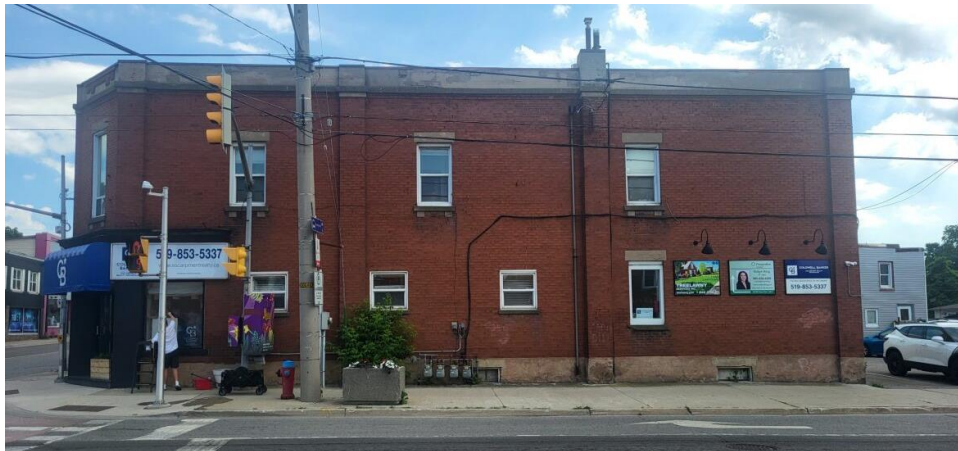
Southwest elevation of the existing building within the subject property (Town of Halton Hills 2024)
